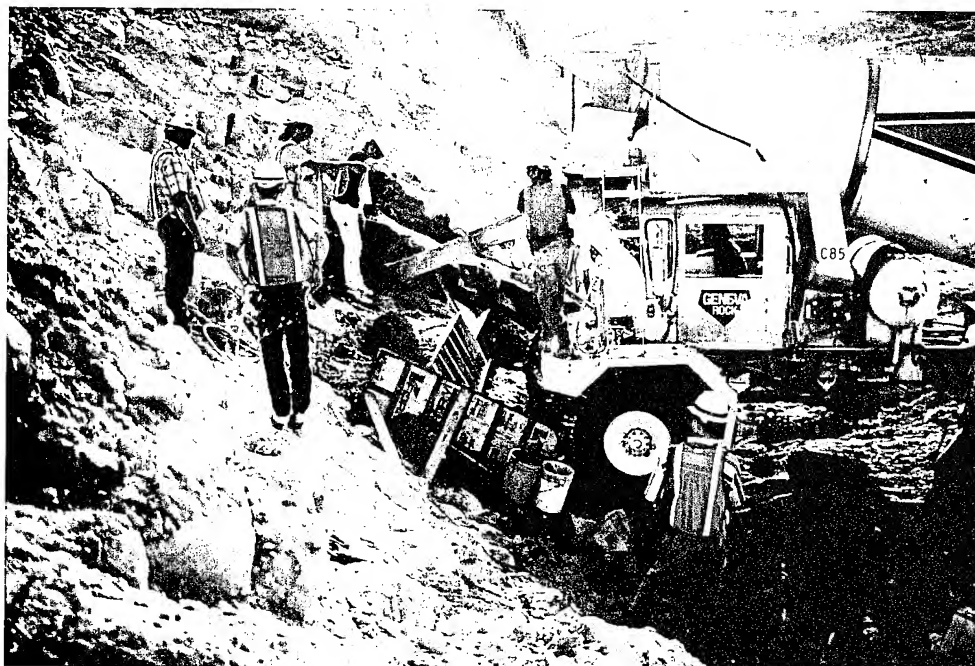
Looking downstream at the placement of a concrete fillet at the left abutment core trench. Note form on near end to prevent thinning (feathering out) at the ends of the fillets.
